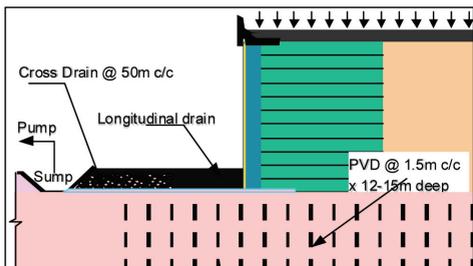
Drainage arrangement detail and proposed treatment above 5.0 m height wall for Structure at km 17.6, 21.98, 23.831, 24.6 and 26.1.
